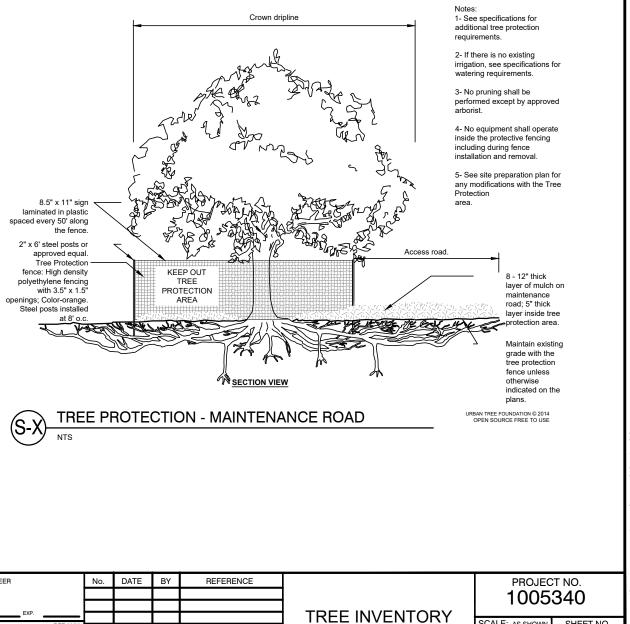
EXHIBIT B - SITE PLAN\_PRAC ITEM 7A\_1.10.24
